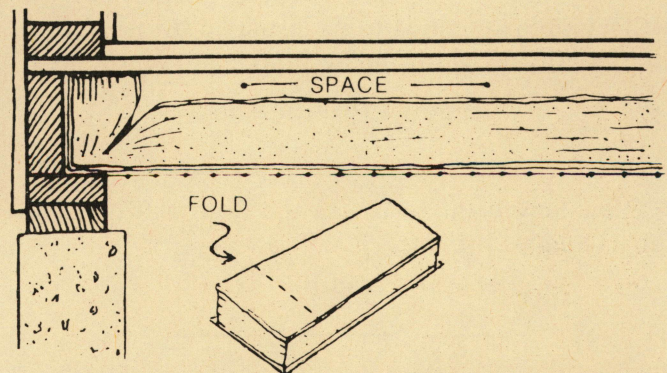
Leave an air space between the vapor barrier and the floor. Batt ends should fit against the bottom of the floor.
